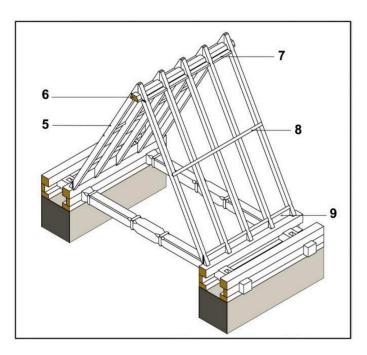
Rafters (5) are placed every 30-40 cm and are connected to the ridge-purlin, called "Carina" (6), at the top of the Inner Roof. Planks (7, 9) are placed in order to close firmly the gaps of the interior cover. A small triangular-shaped wooden section (8) is penetrating the upper surface of the rafters, in order to connect them firmly to the coming wooden boards. (M. Pelekanos). [13].
